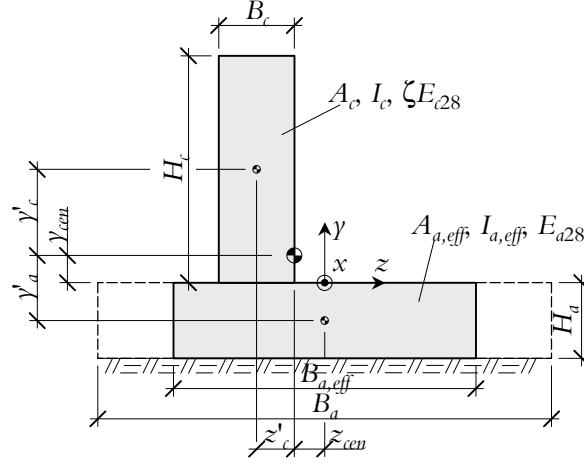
Cross-section properties used in the semi-analytical method for typical case wall on slab.
